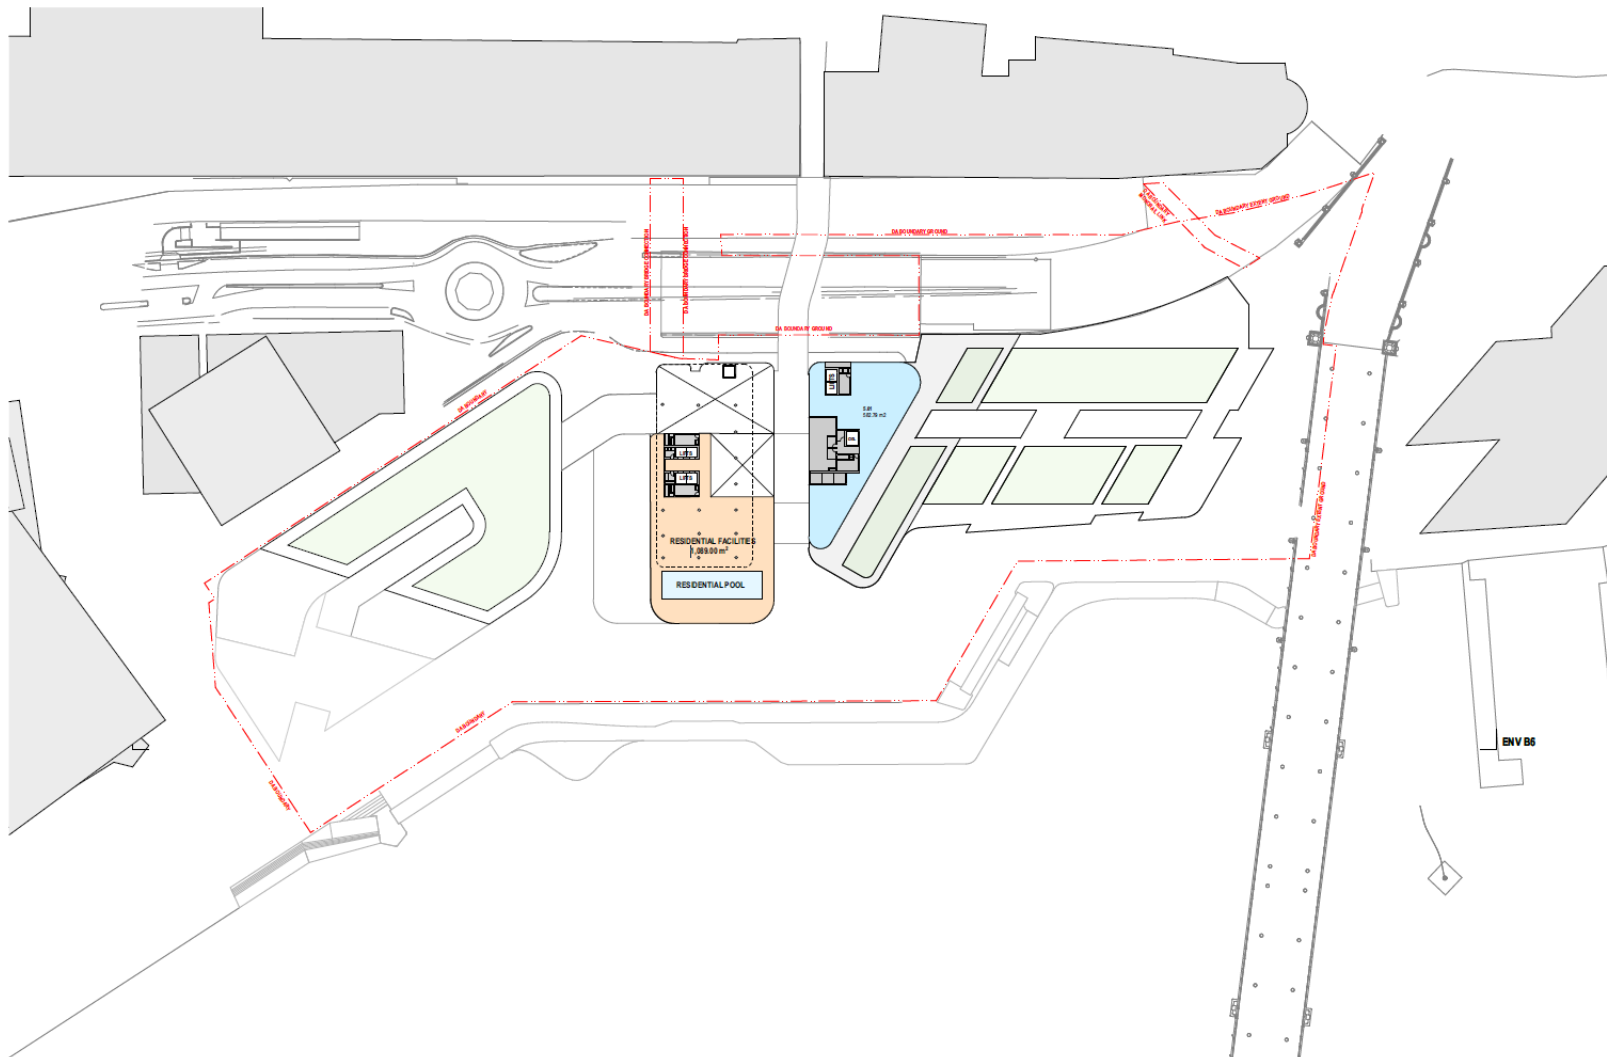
Level 5 Retail / Residential & Podium Roof Plan – Indicative Plan Only (Source: FJMT, 2020)
